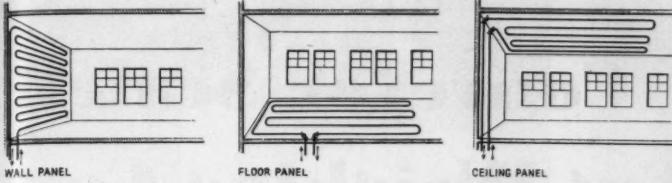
(Above) Radiant heating is recommended in warehouses. Although best installed in new buildings, it is possible to convert old houses
